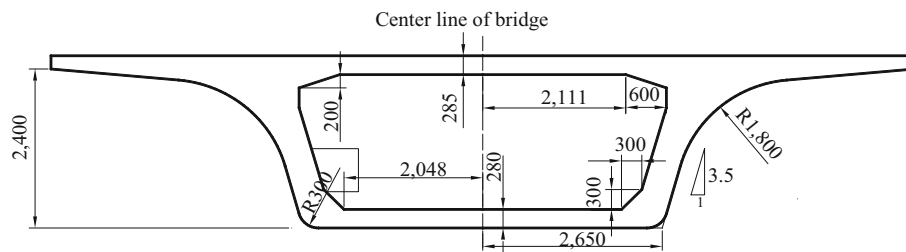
Cross section of simply-supported box beam (unit: mm)
